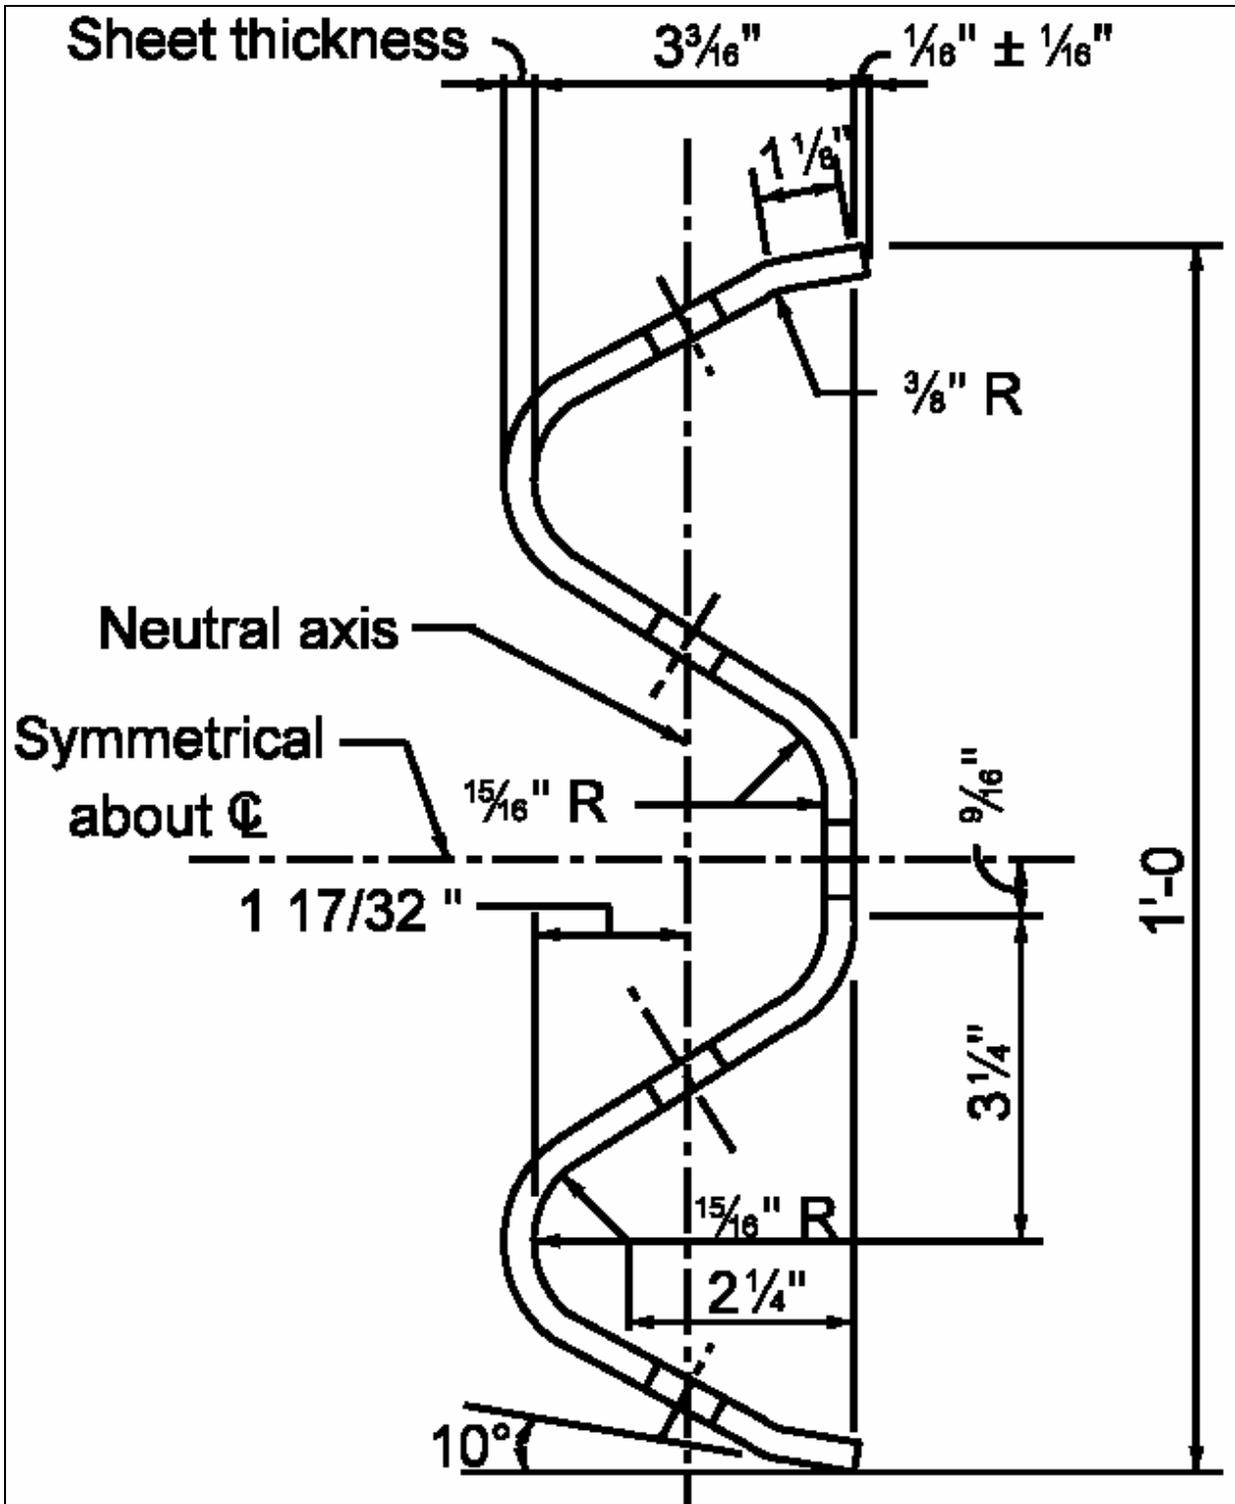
Typical W-Beam Guardrail Profile (30).
